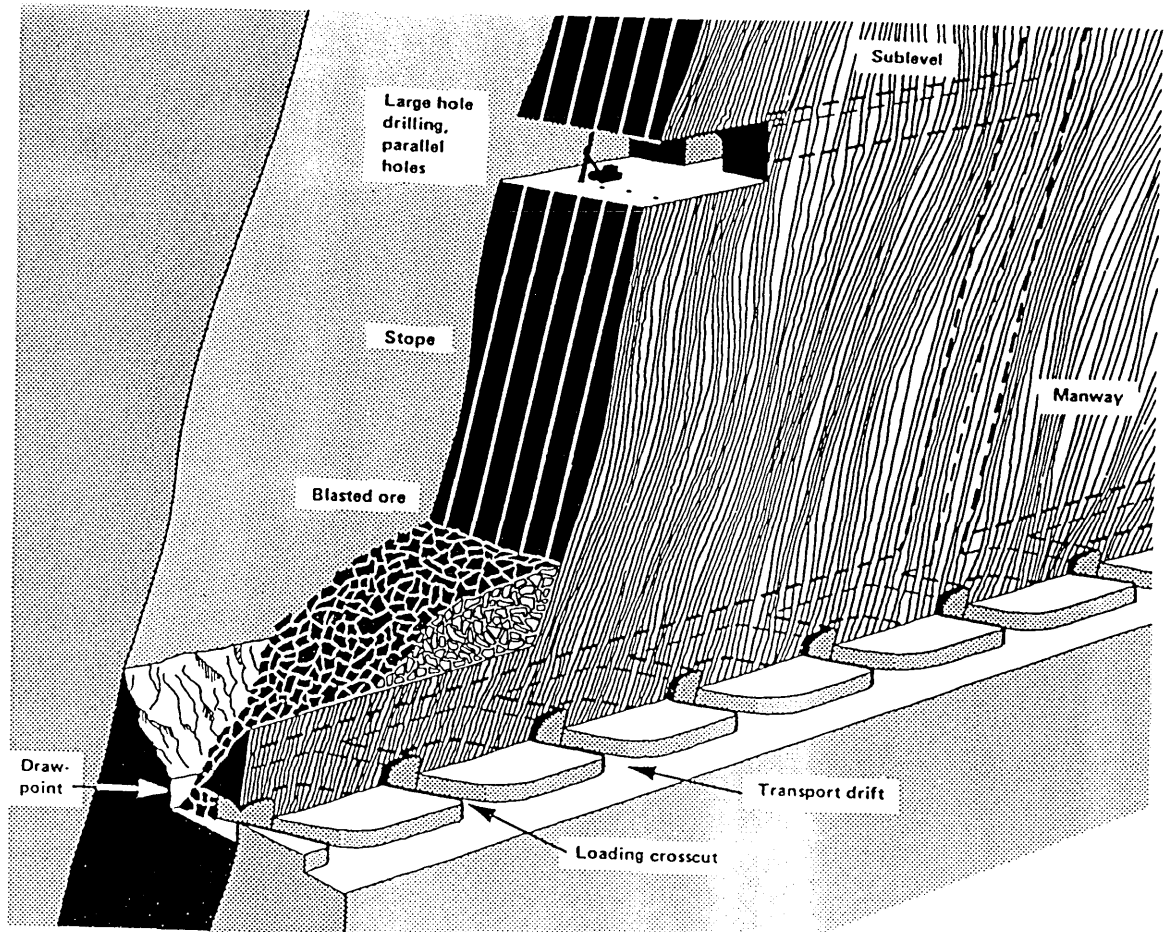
Sublevel open stoping with large-hole drilling and blasting (after Hamrin, 1982).
